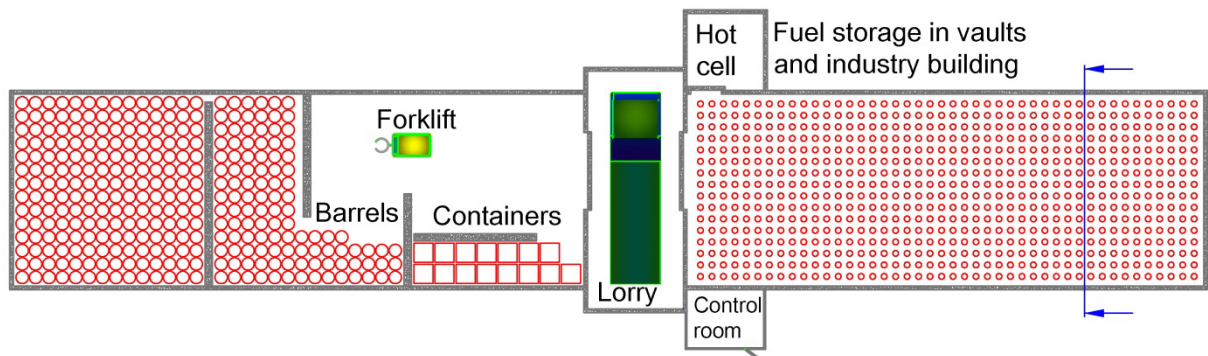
Plan view for fuel storage in vaults, industry building.
